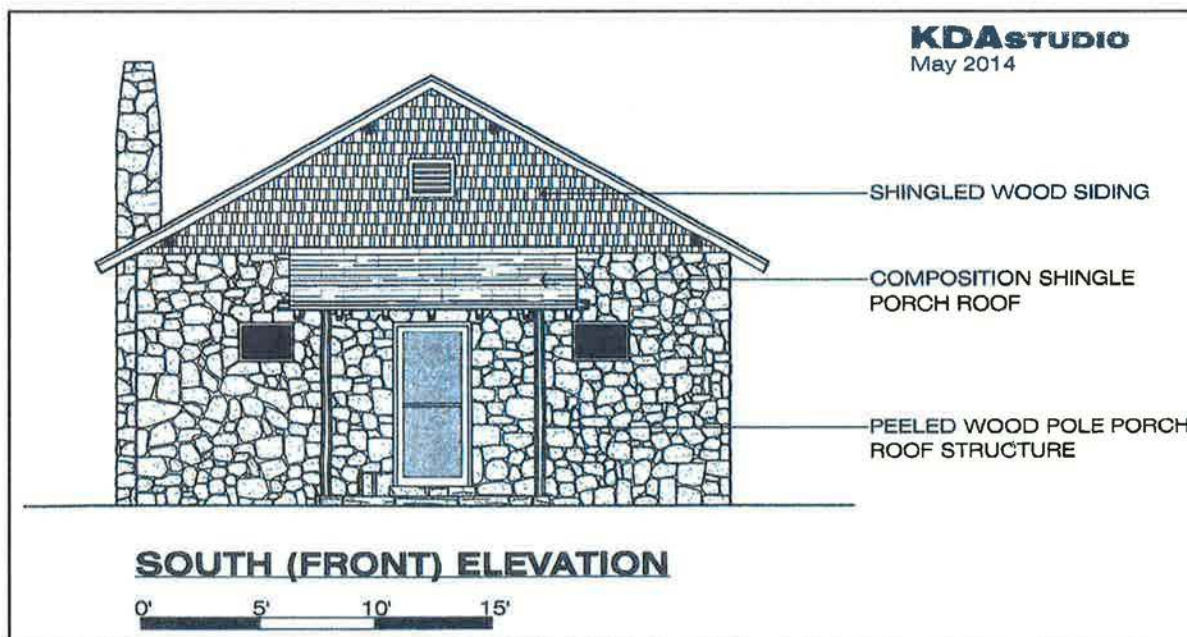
Front elevation of Rock Schoolhouse at Beaver Creek School. From *Documentation of Existing Building: Rock Schoolhouse, Beaver Creek Elementary School*, KDAstudio, 2014.
